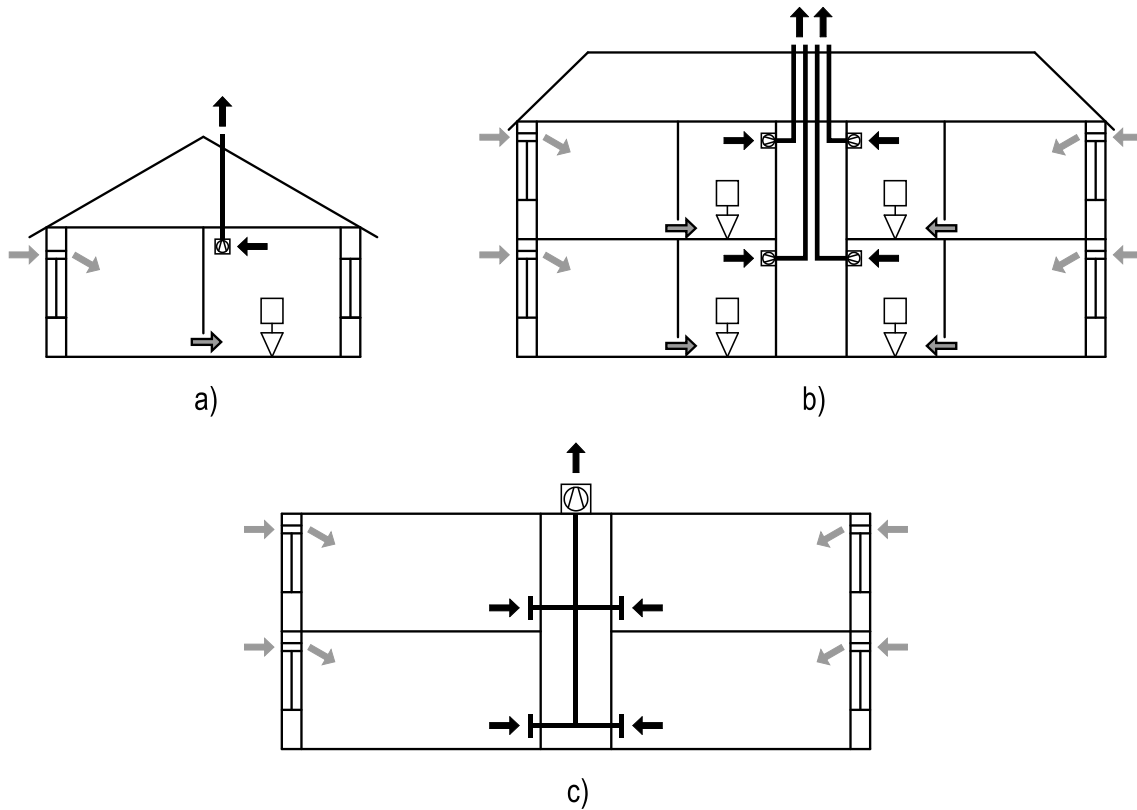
Ventilation system 3A: a) house; b) apartment building; c) office building
